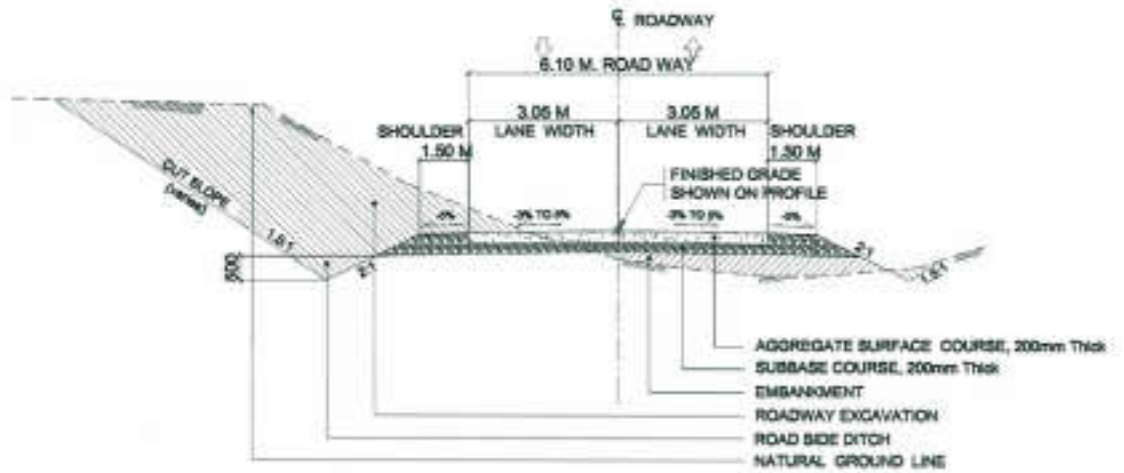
TYPICAL ROADWAY CROSS-SECTION FOR ROAD OPENING
